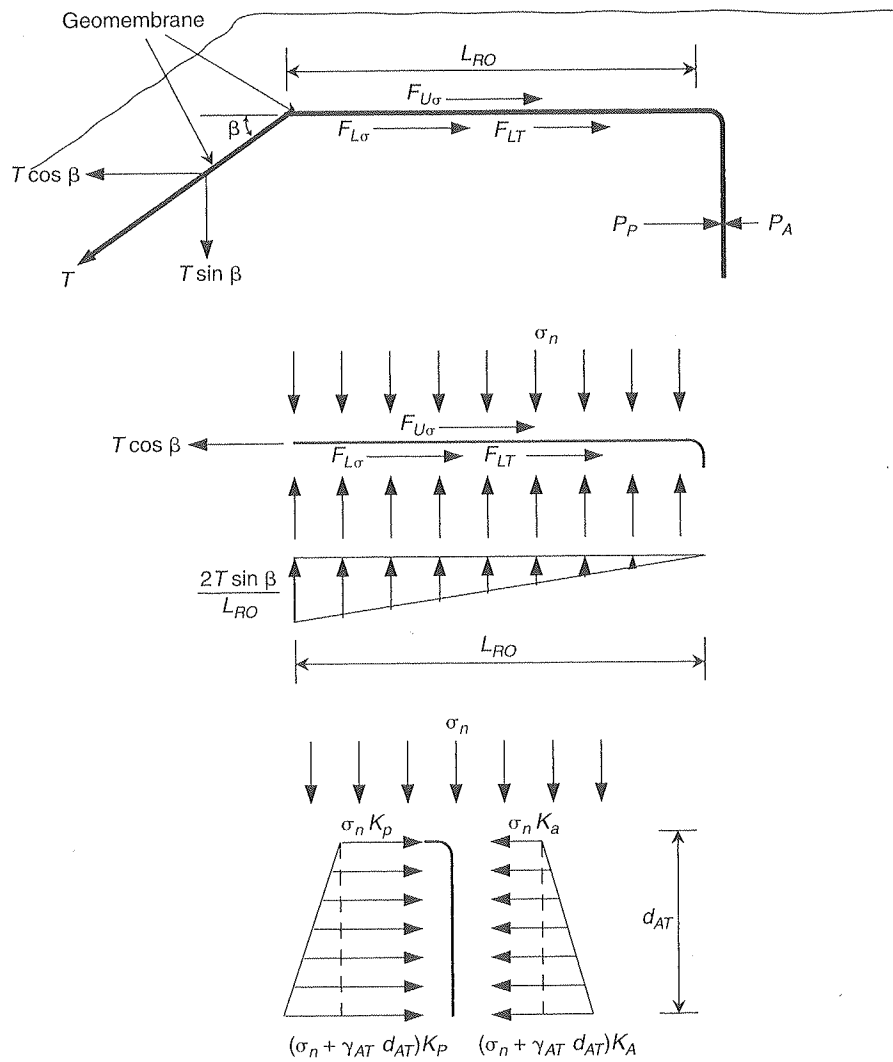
Cross section of geomembrane runout section with anchor trench and related stresses and forces involved.
